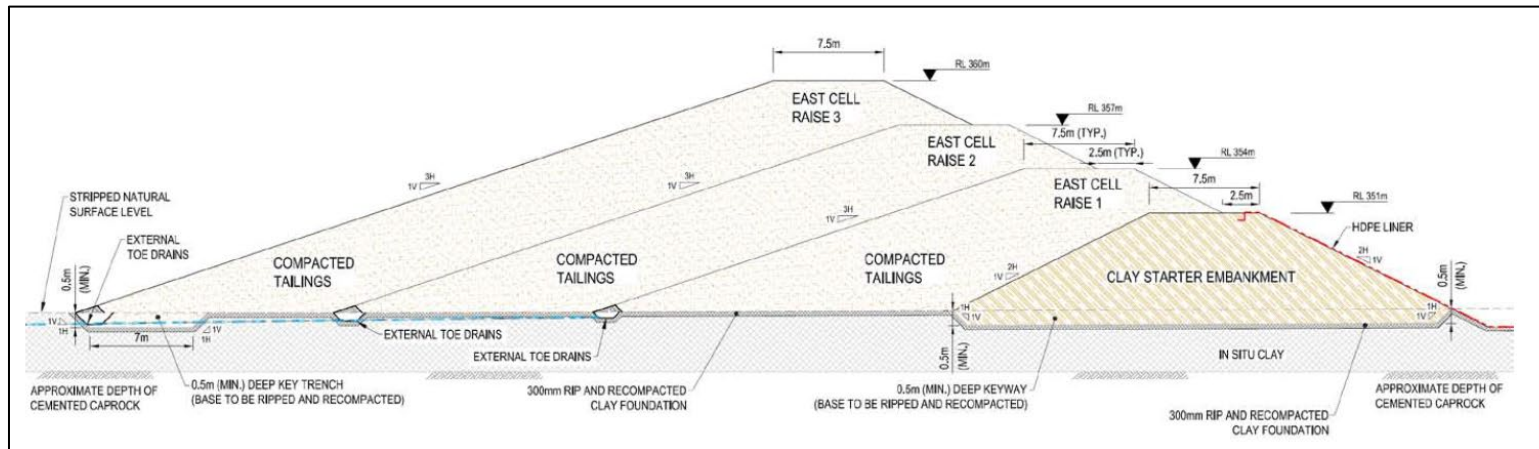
Gidji II typical cross section of outer embankment walls (downstream construction)
